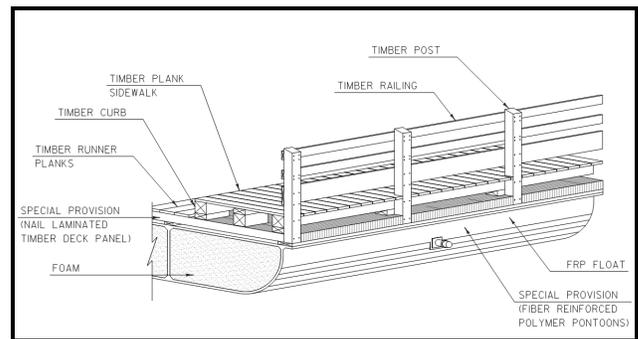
FRP pontoon with timber decking, sidewalk, and railing.
